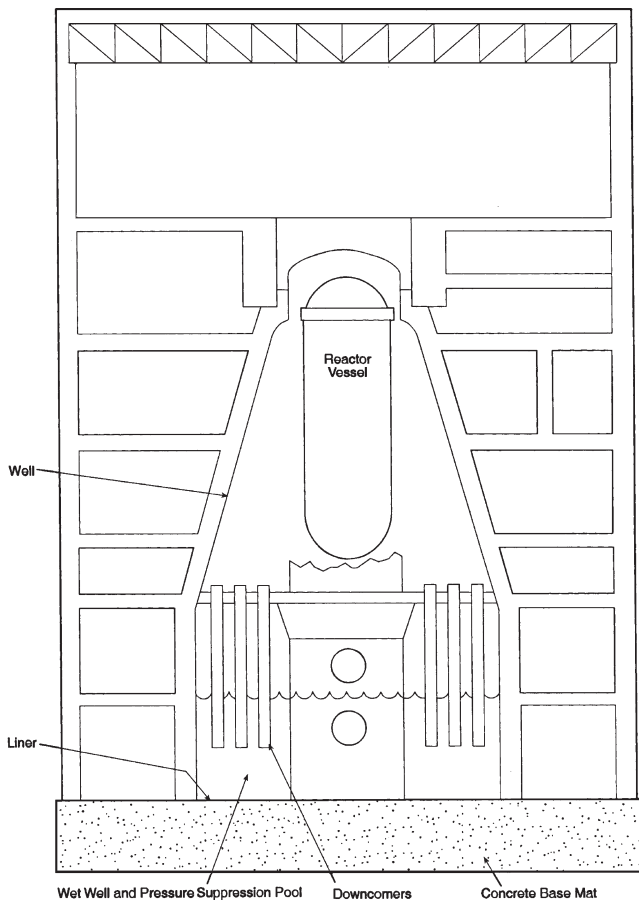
BWR MARK II CONCRETE CONTAINMENT
